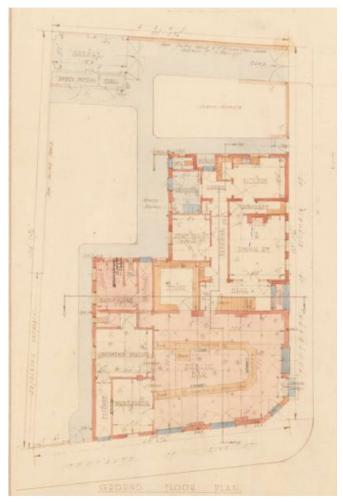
Sidney Warden's architectural drawing for the new White Horse Hotel. Dated June 1929, showing the ground floor
